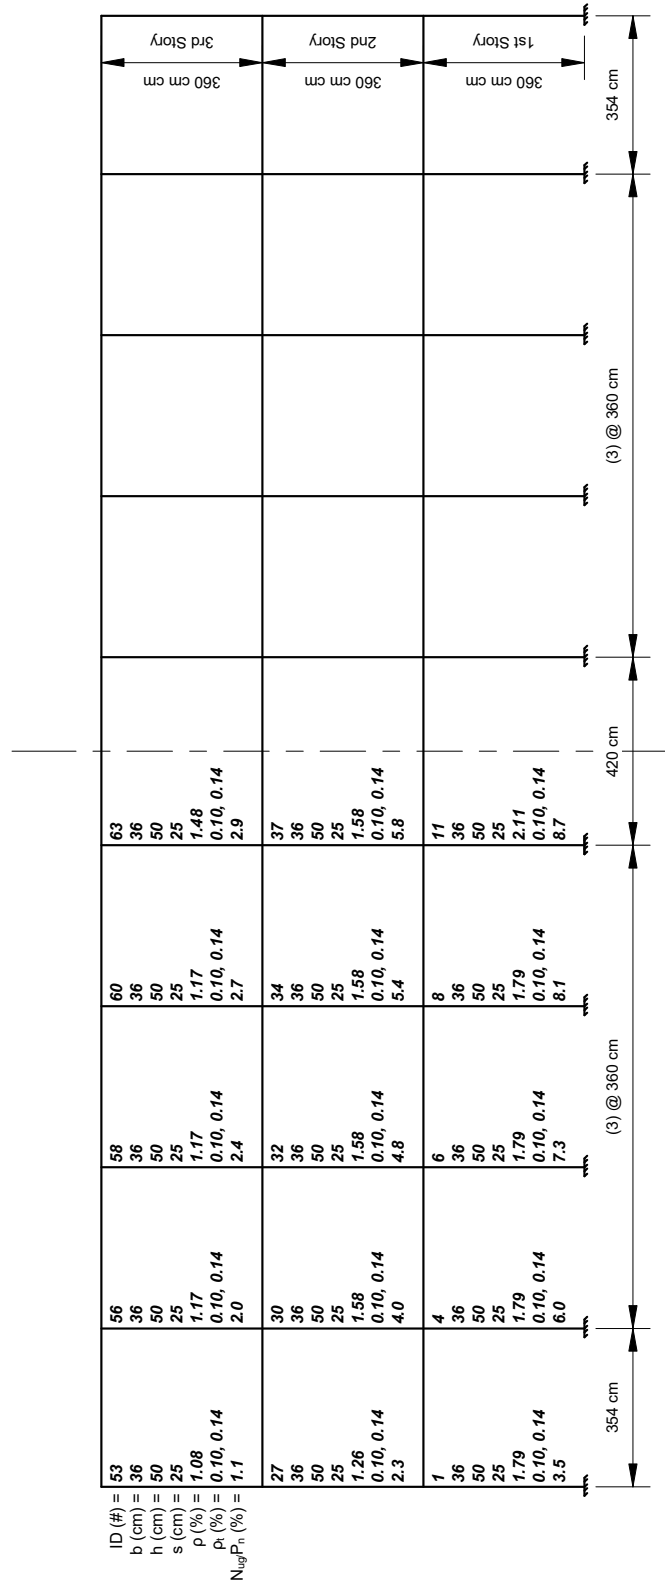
Grid A, EW, Structural Parameters for (1st Story) Columns
